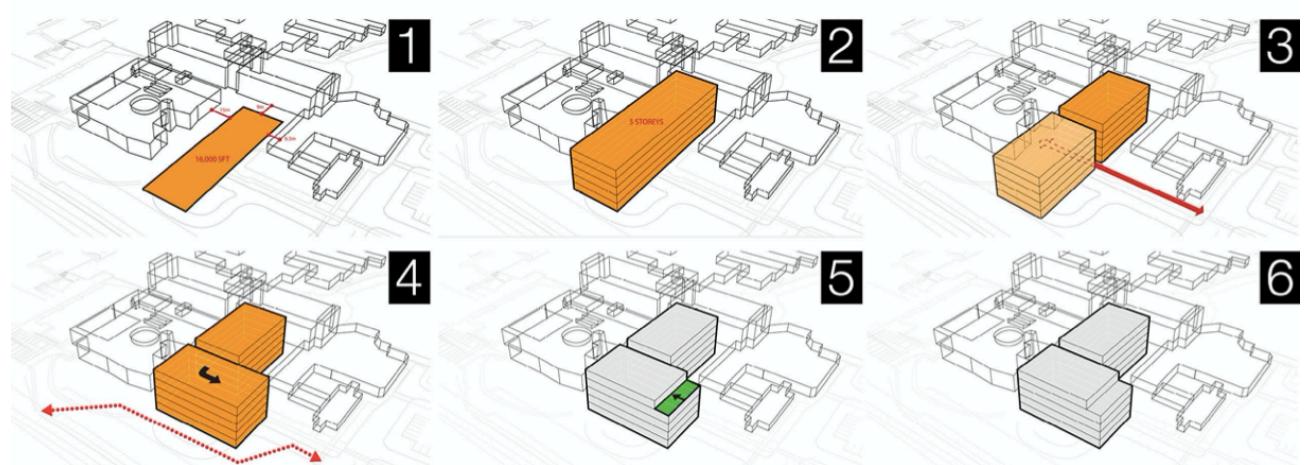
Illustration of the proposed building within the site layout by Pierre G. Bordeaux
